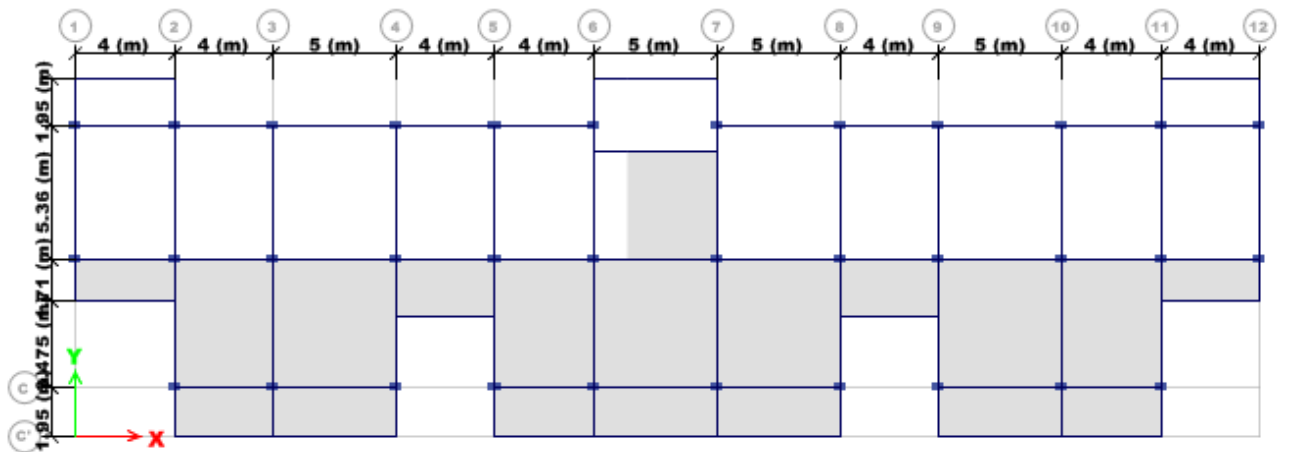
Plan view of Eight Storey RC Building without shear wall
